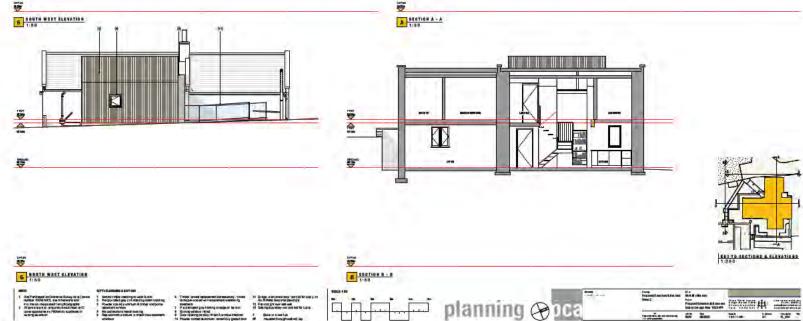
PL_003 Proposed Elevations and Sections: Sheet 2 (not to scale)
